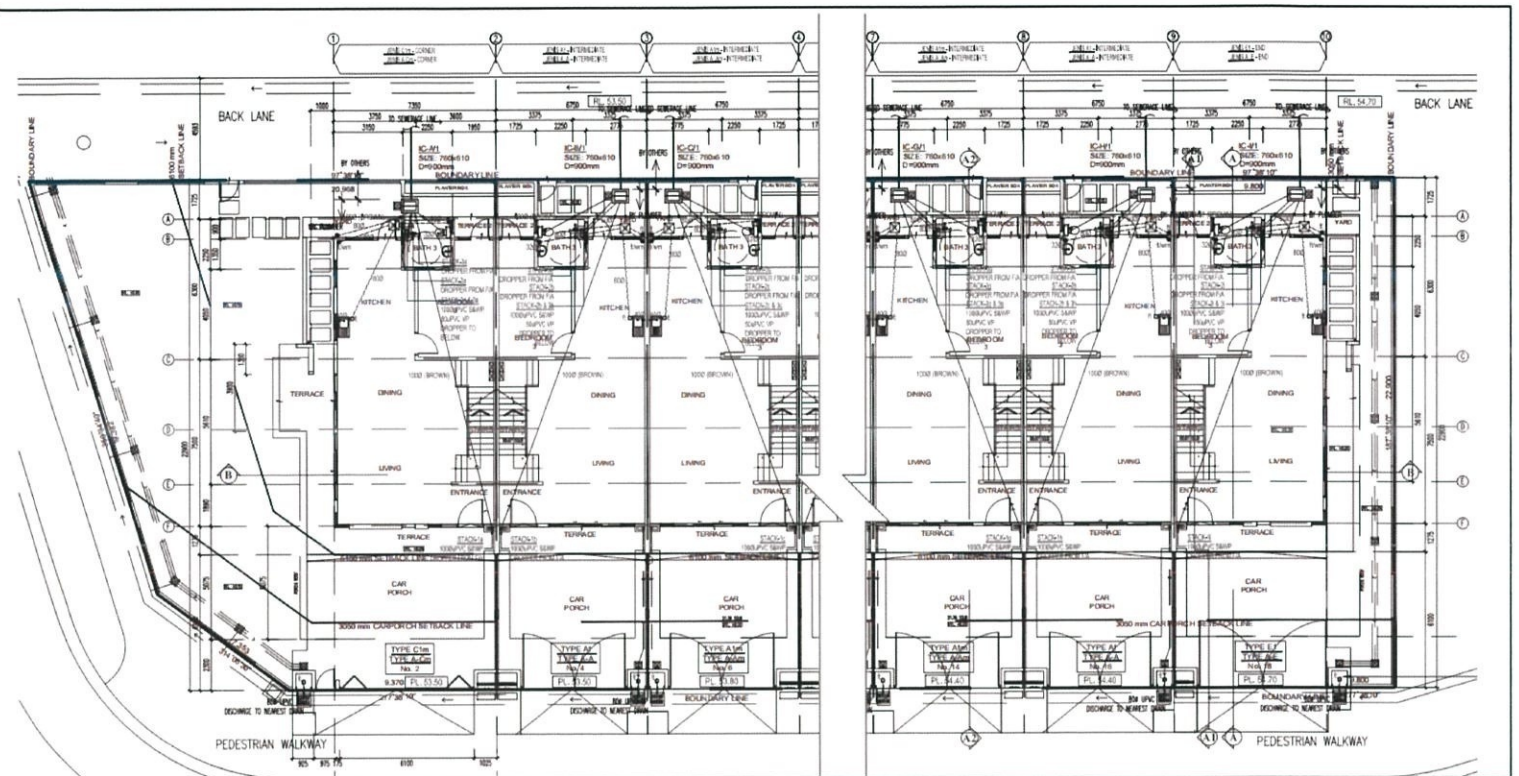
Sanitary Services on Ground Floor Plan - Typa A (Standard)
